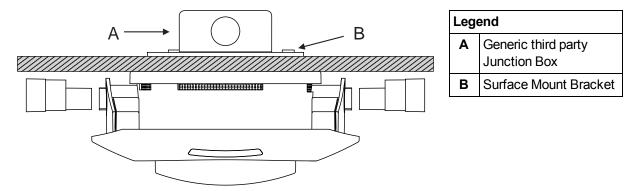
Mount on suspended Ceiling Tile with Junction Box
